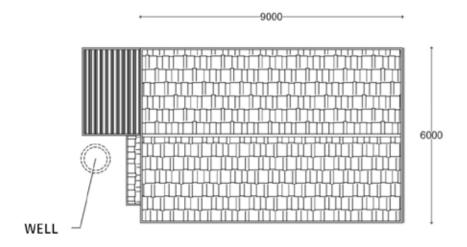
The Existing Plan of Mr. Purwanto's House
